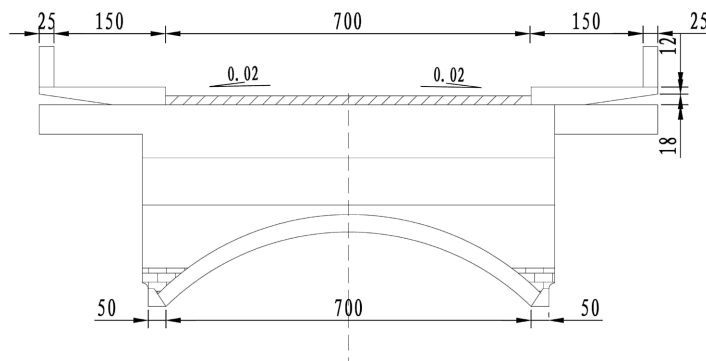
Cross-sectional diagram of the bridge (Unit: cm)
